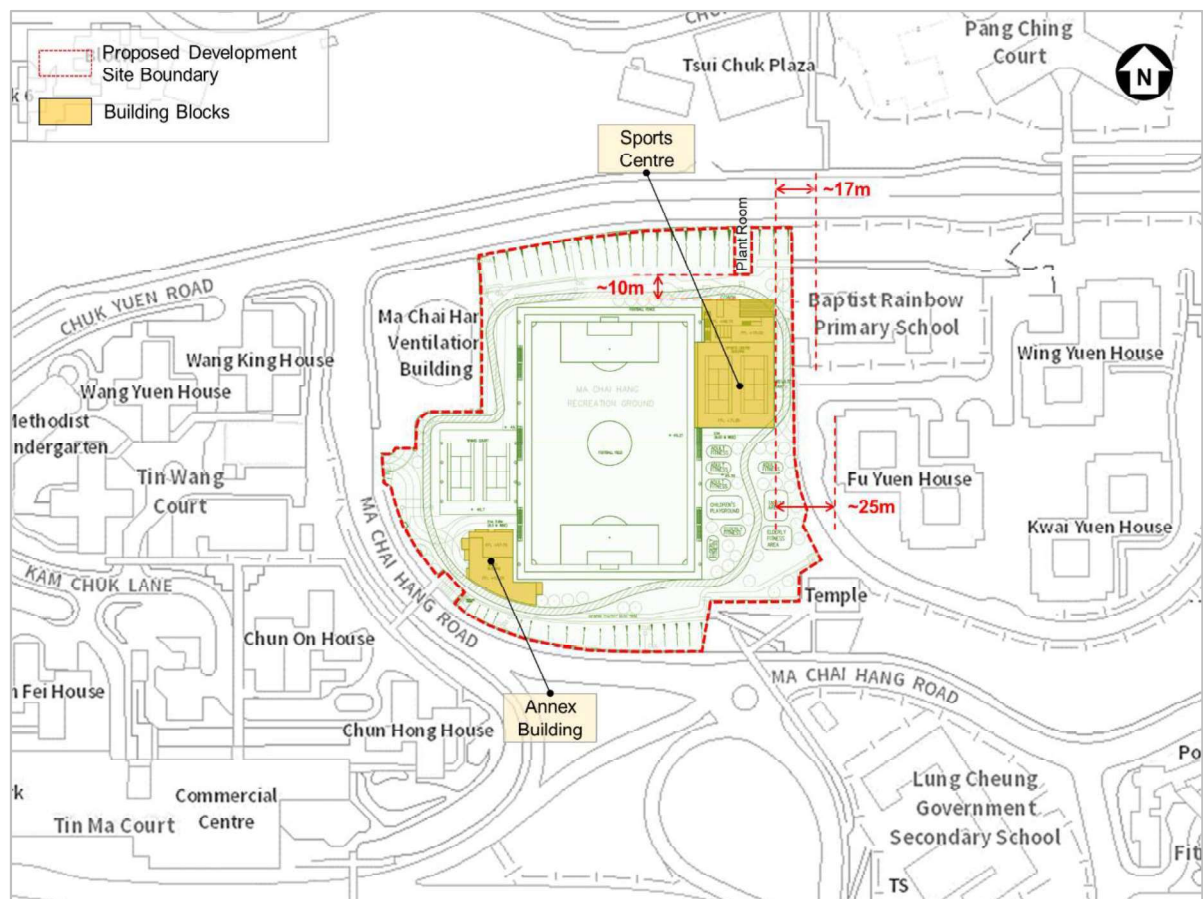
Top View of the Development Site Layout Plan (Initial Development)
